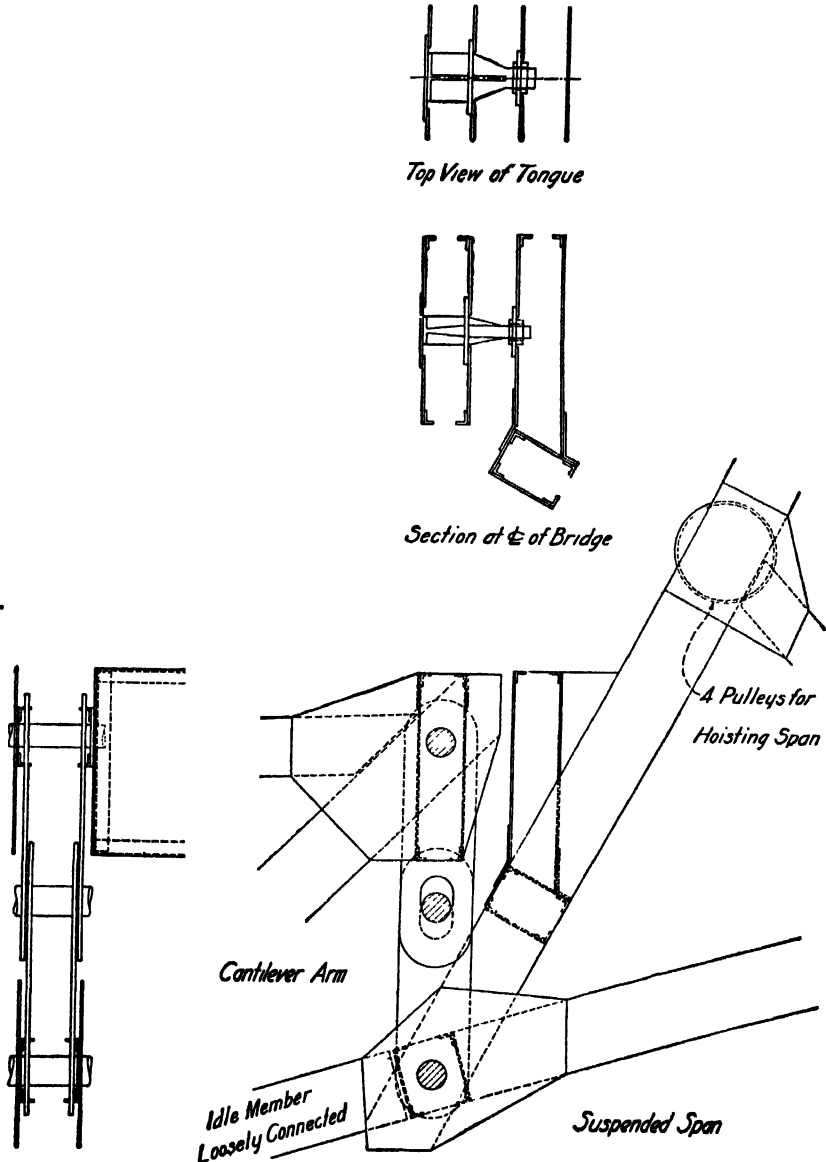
Detail of Connection between Suspended Span and Cantilever Arm for the Transmission of Wind Loads.
